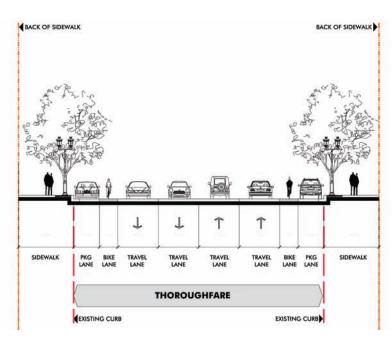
C.4: POTENTIAL CONCEPT STREET SECTIONS
